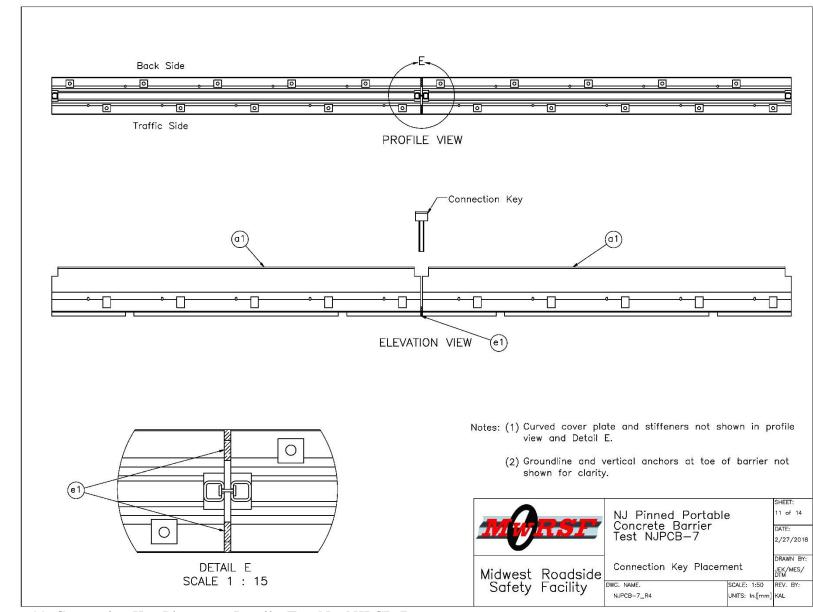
Connection Key Placement Details, Test No. NJPCB-7
